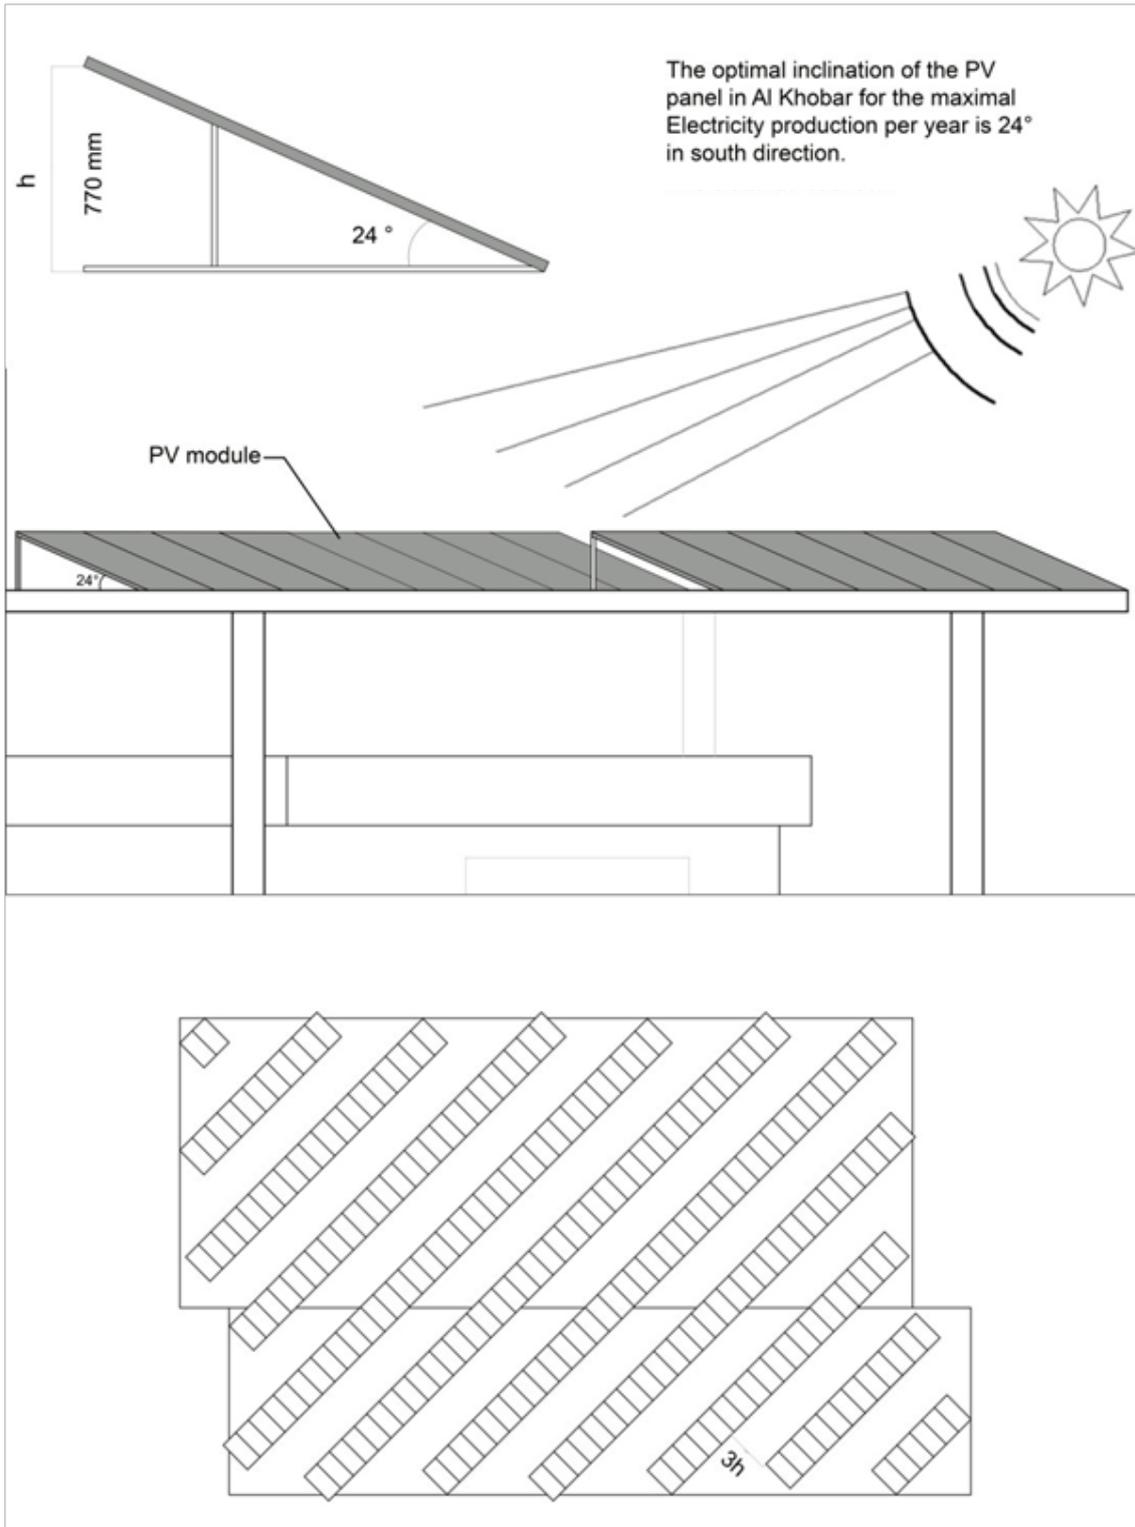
Autocad design showing the layout of the panels at 24° tilt angle in south orientation set on the canopy in project.
